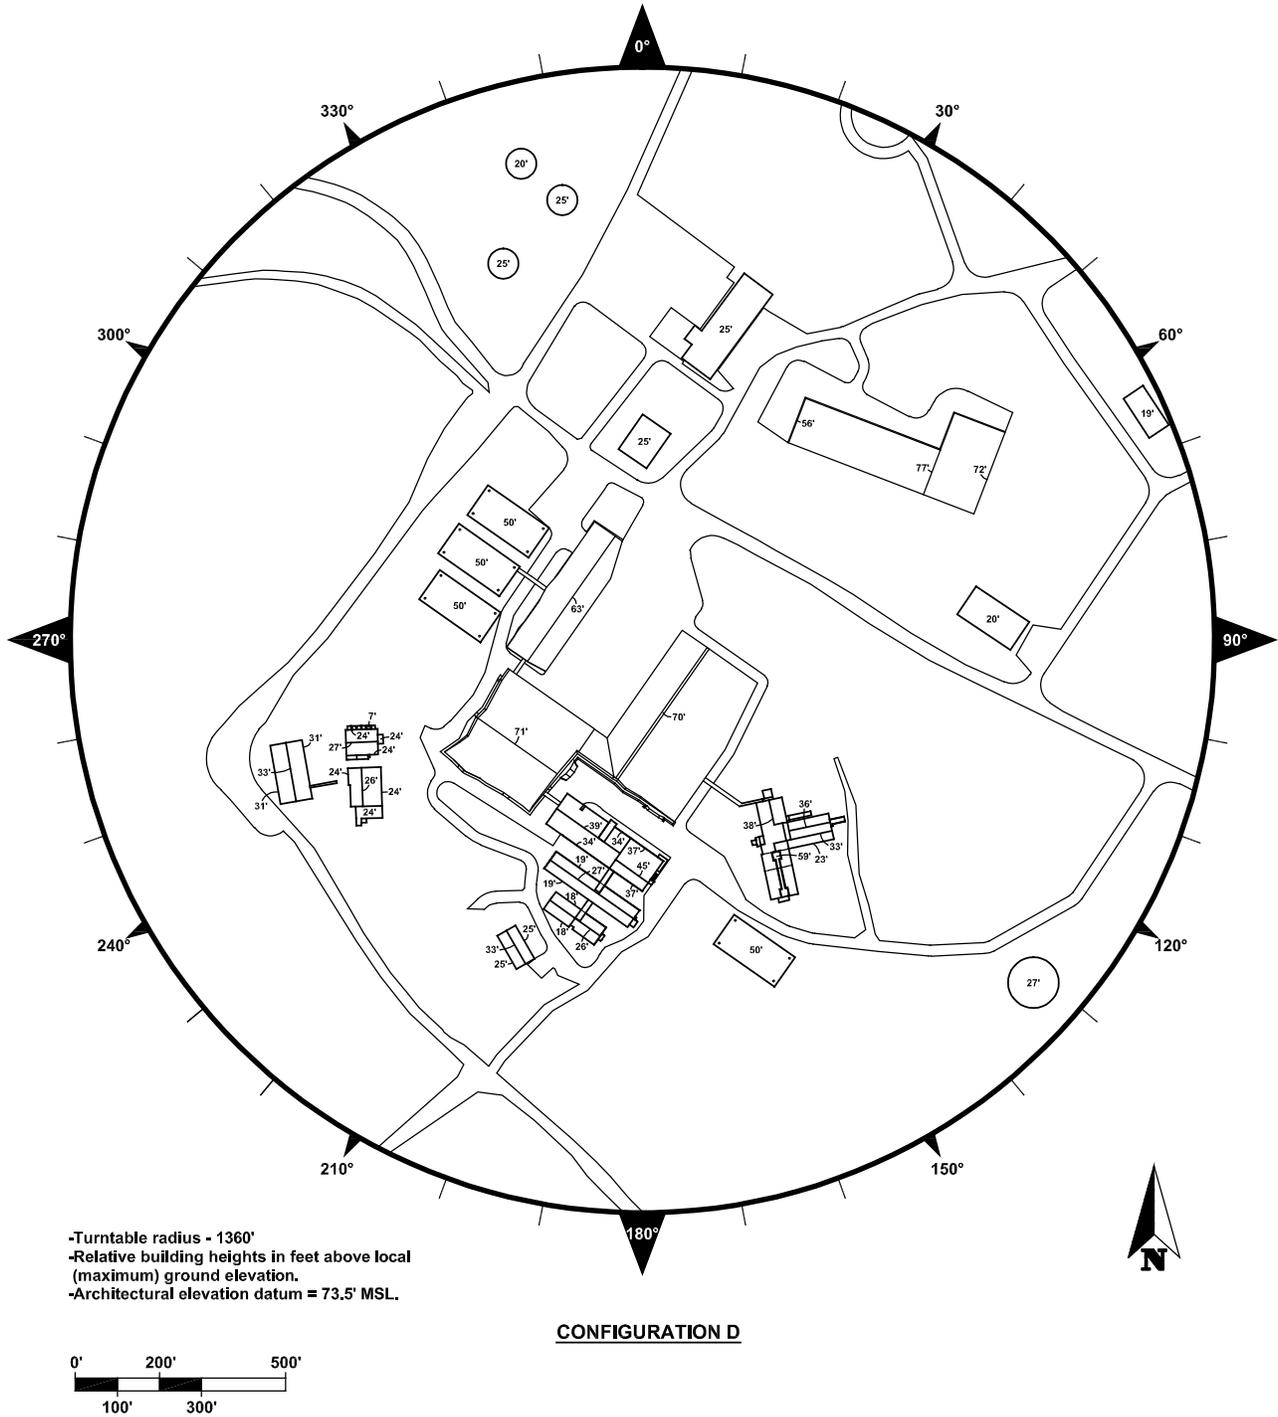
Site plan of the McMurdo Station with building heights: Model Configuration D
